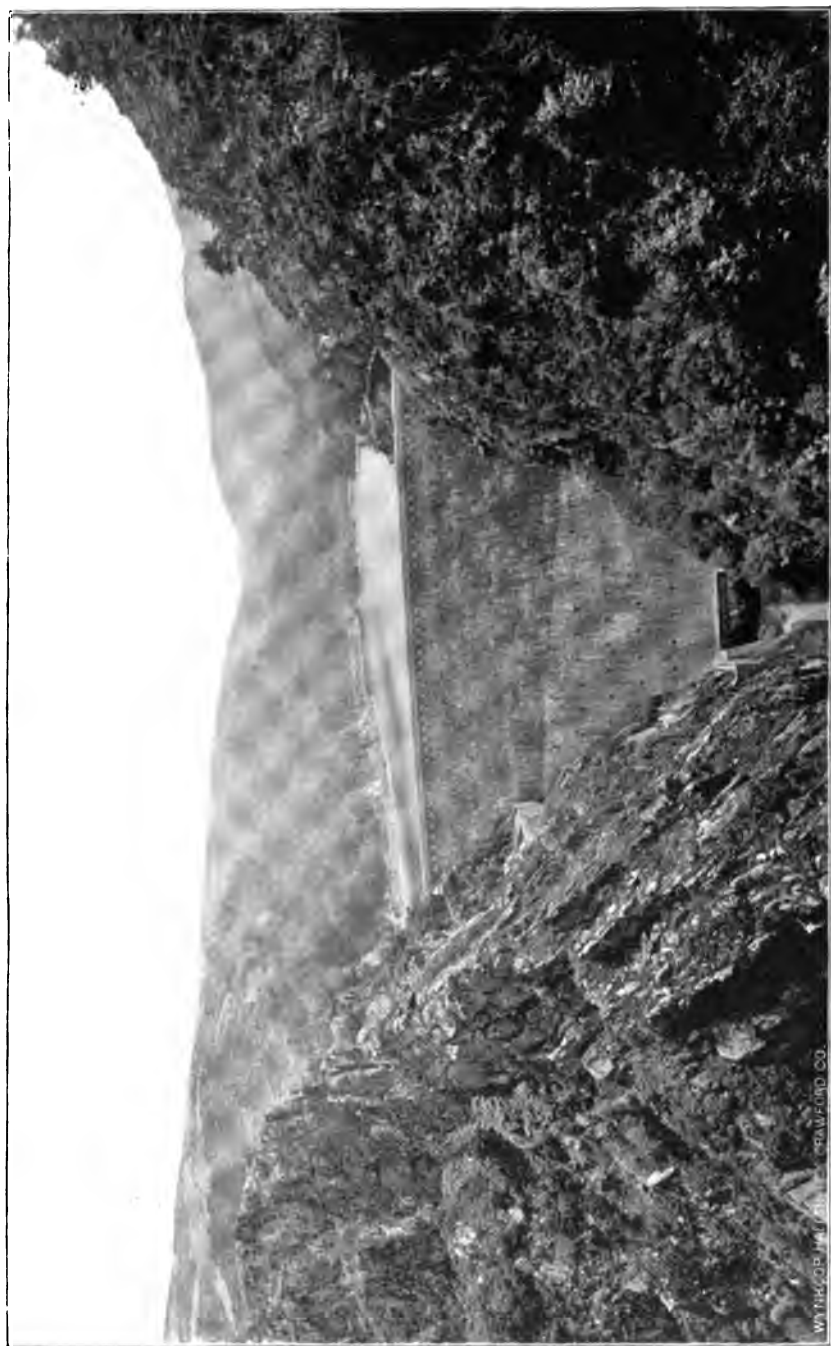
PLATE XLVII. VIEW OF THE FRONT OF THE FURENS DAM—ALSO SHOWING STAIRWAY, AND NEW CHANNEL FOR RIVER
